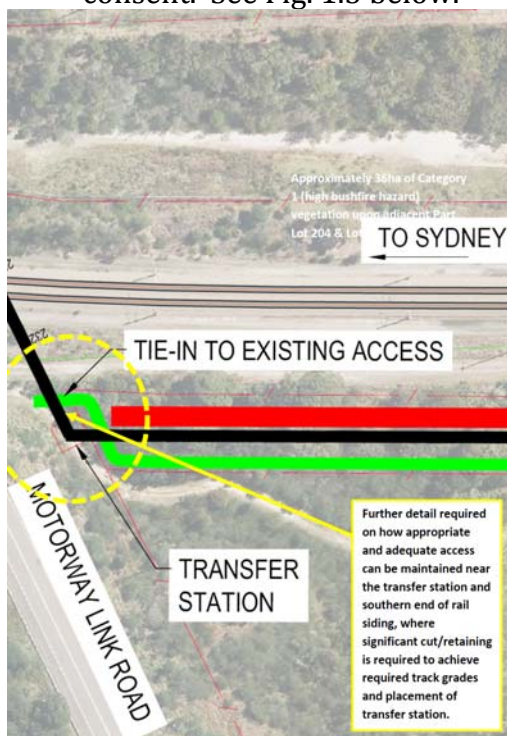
Detail required for continued access under Link Road overpass – provided by Wallarah 2 Coal Project on 29 August 2016 (not included in amended Development Application)
